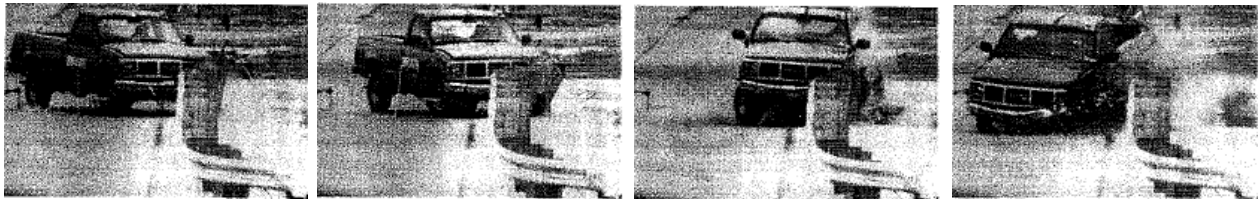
Sequential photos for Test 471470-30 on the modified three-beam guardrail (SGR09b) under NCHRP Report 350 Test 3-11 conditions. [Mak99]
